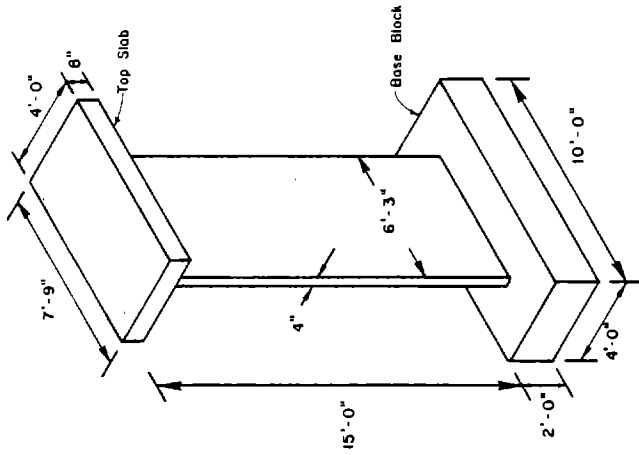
Nominal Dimensions of Test Specimen with Rectangular Cross Section
